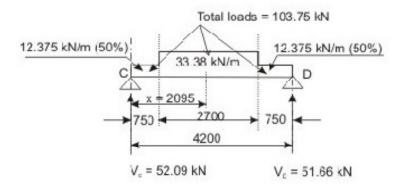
Loads of section 1-1, Fig. 9.20.15, (Example 9.2)
